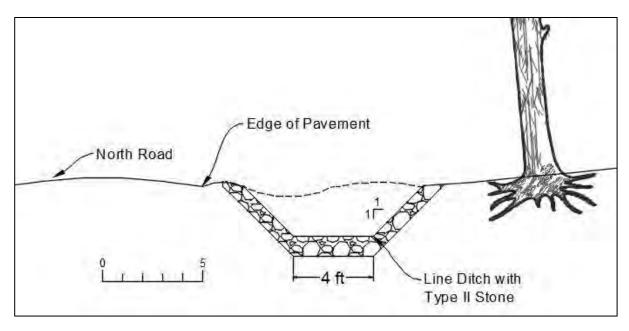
Simplified cross-section sketch of an oversized rock-lined ditch to provide flood relief along North Road. The ditch would be designed to convey approximately 50-60cfs of water with at least 0.5ft of freeboard to the roadway elevation.
